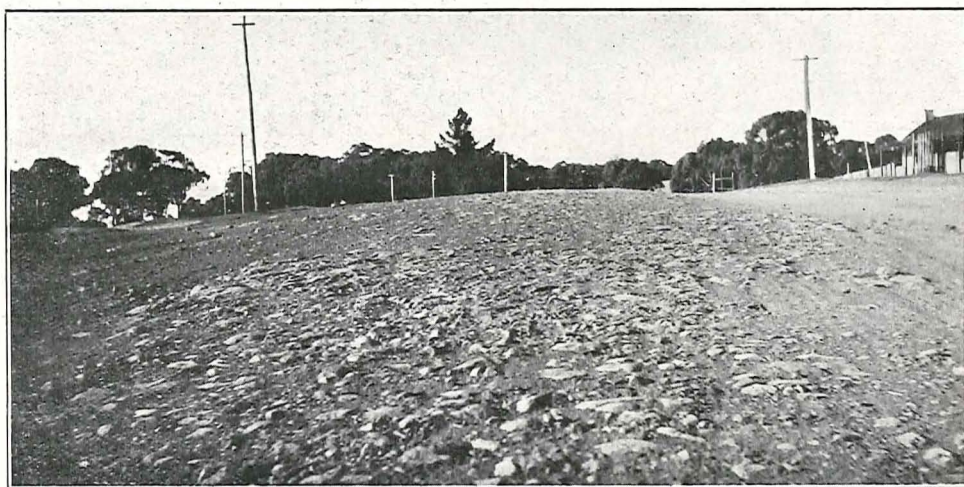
Showing neglected section, Melbourne-Bendigo Road, now being re-constructed.
